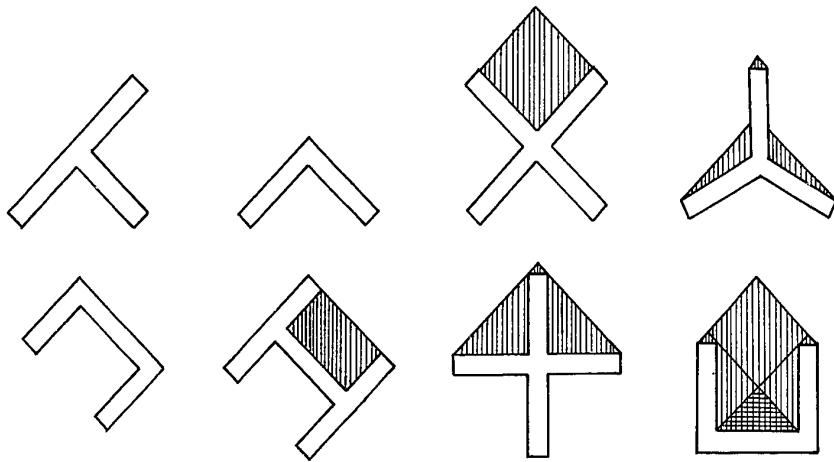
Sunlighting and shadowing of various plan types:north is at top.
